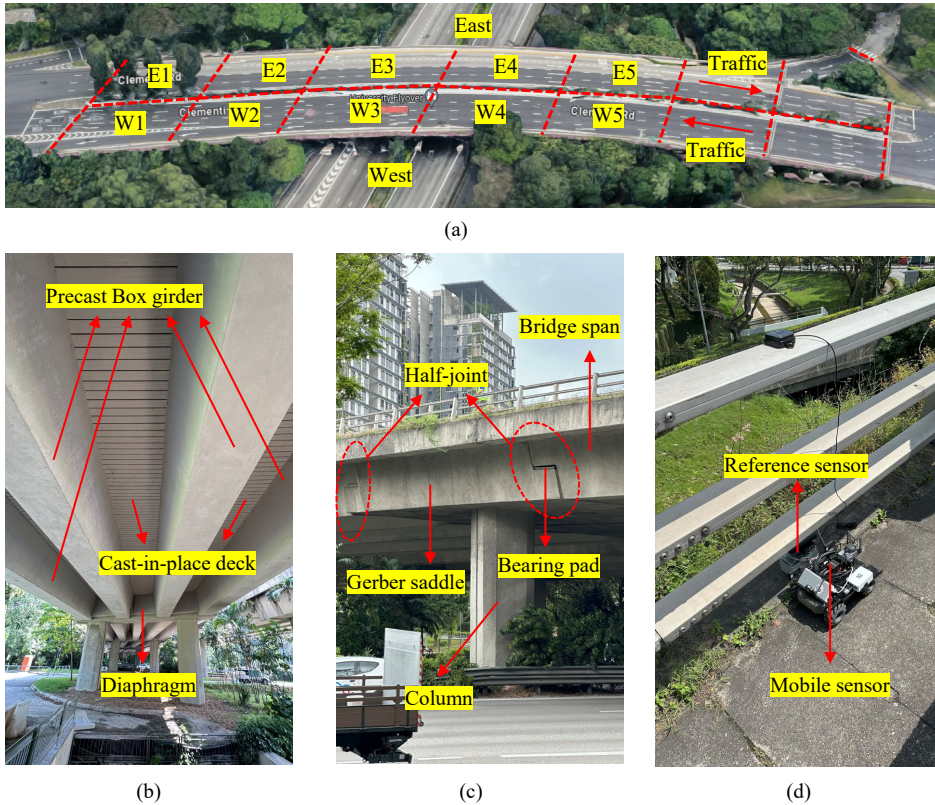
Photos of tested bridge spans and test setup: (a) Top view, with tested bridge spans on the east and west sides labelled E1-E5 and W1-W5; (b) Bottom view, showing the structural type as a multi-girder box bridge; (c) Side view, illustrating the simply supported boundary conditions; (d) Sensor deployment on the bridge, with both sensors deployed on the footpath.
